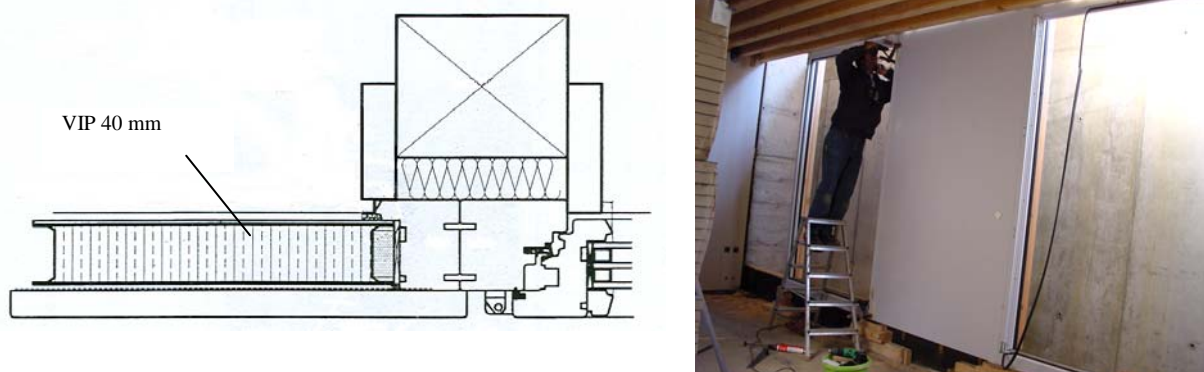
Vacuum insulation panels in the form of stainless steel cases used as outside wall elements on single-family terrace houses in Binningen / Switzerland. Left: Horizontal section through the construction. Right: Installation of the VIP. (Architect: Feiner Pestalozzi / VIP-construction: Häring AG)
